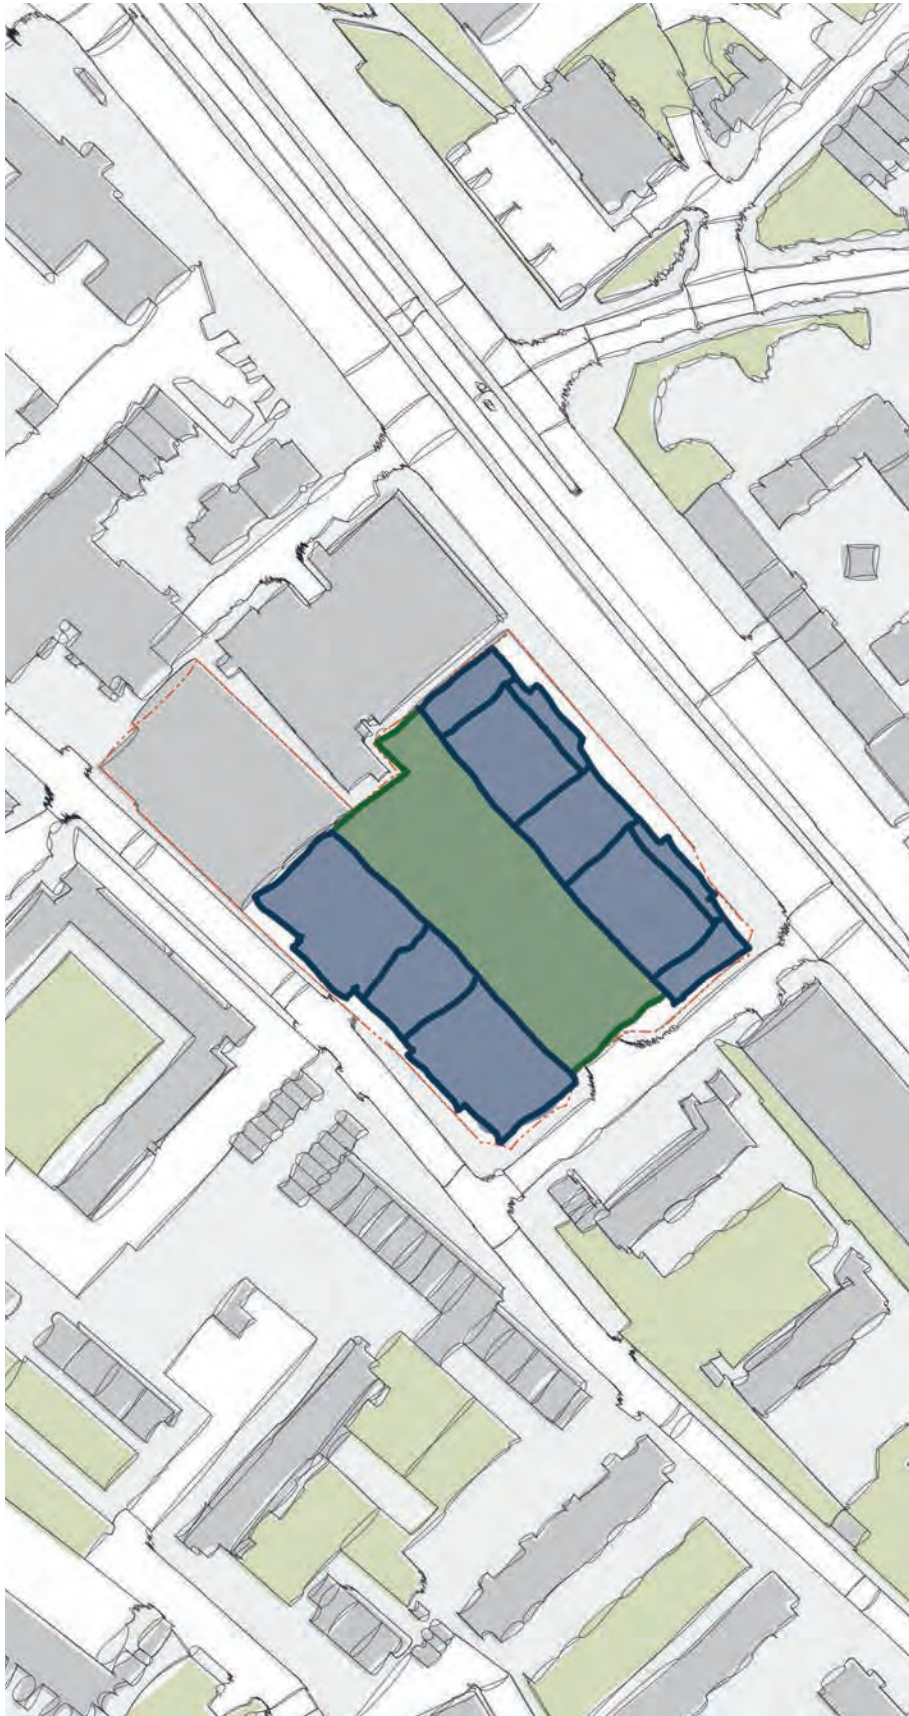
Provide a podium garden above Lidl store and two linear buildings
